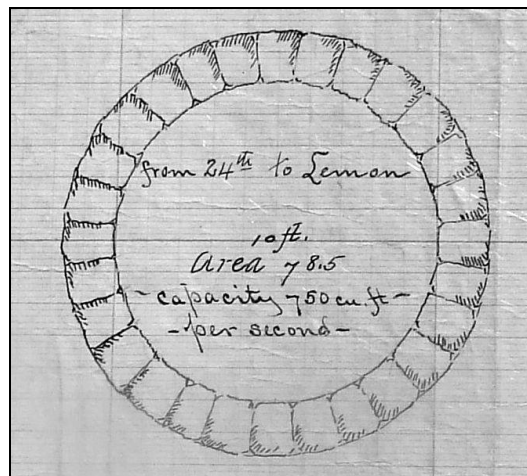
Bee Branch storm sewer design, 24th to Lemon, section
